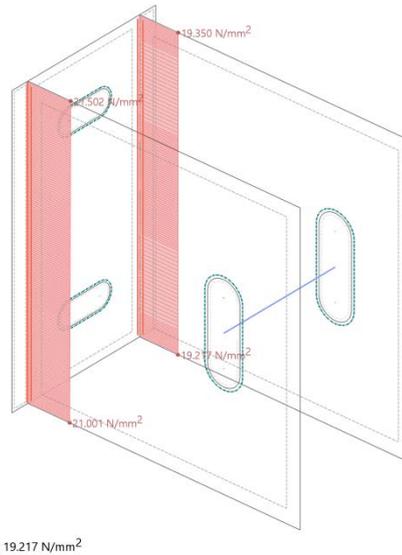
Existing stresses in the weld seam (extract from RFEM 6.02)
